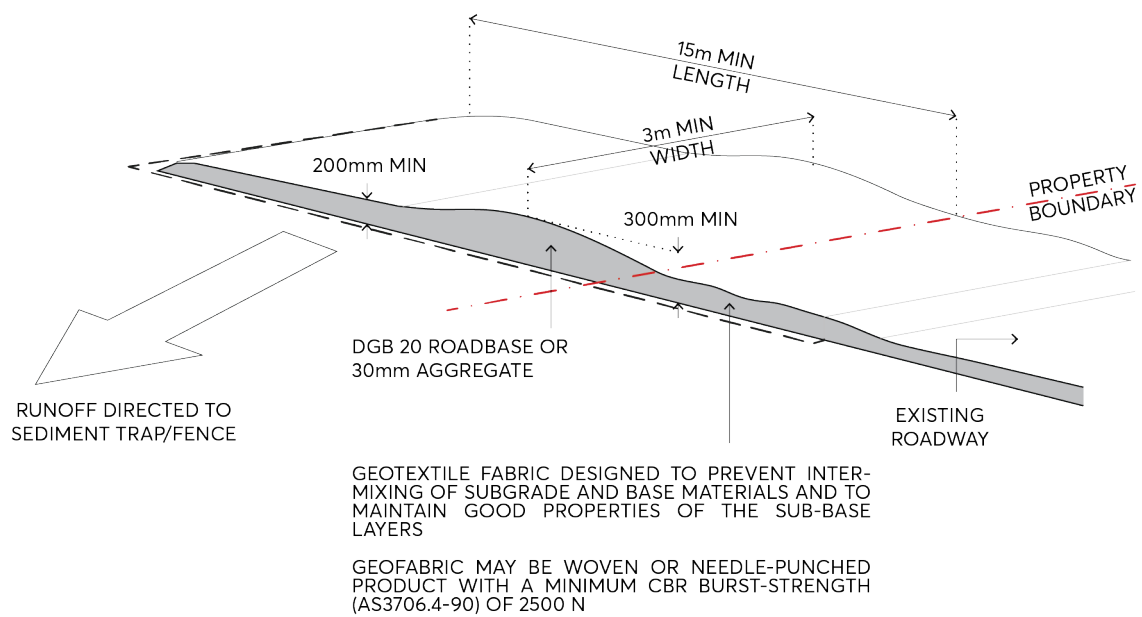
Stabilised Site Access (Source: Soils and Construction: Managing Urban Stormwater, Landcom, March 2004)
